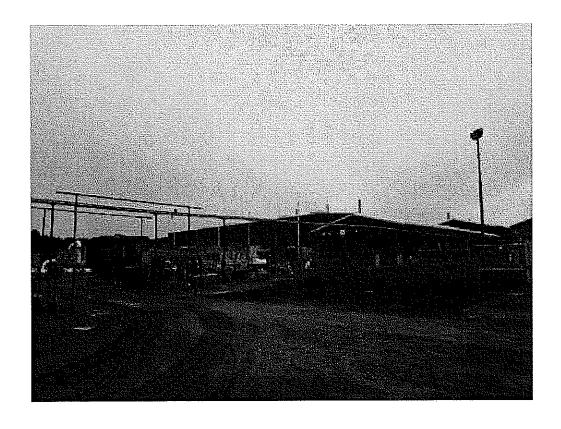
(New Plant 3): New Plant 3 that is undergoing construction. It will replace Plant 1 and 2.
